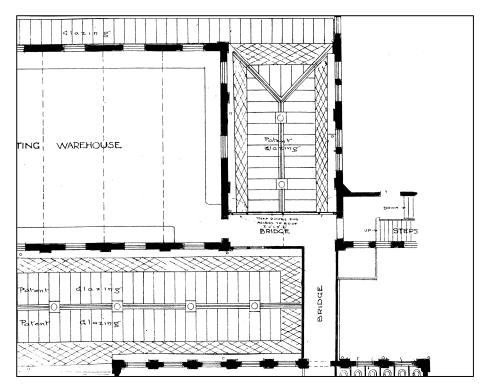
The west ends of Buildings S and O. The bridge runs across the end of O and divides left to S and right to R. The glazed area covers the open space between the west end of Building S and east elevation of Building R.²⁰
